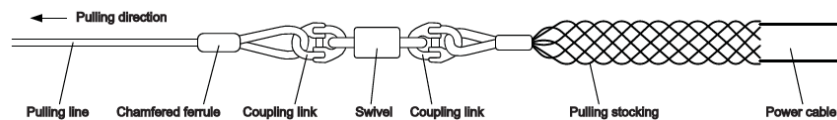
Cable End Connection to Pull-in Rigging (typical from [6])
